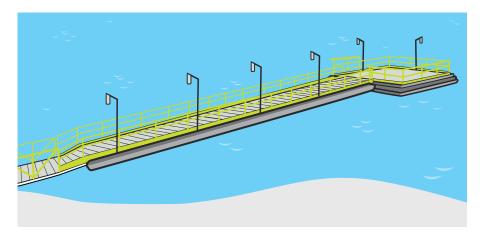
Example of gangway Where using jetties, gangways, platforms, bridges or walkways they should be fitted with suitable handrails or other means to stop people falling in the water (see Figure 60).
